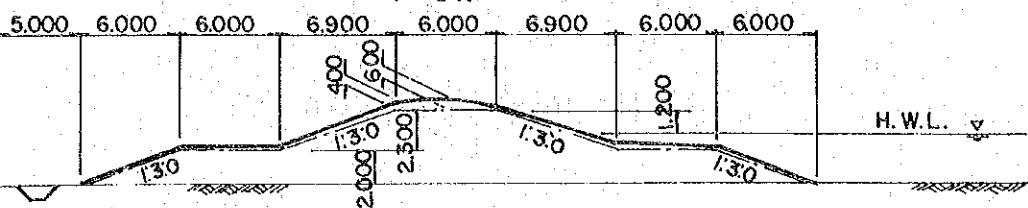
TYPICAL CROSS-SECTION FOR PROPOSED LEVEE
